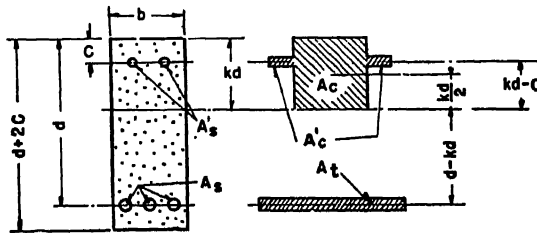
Concrete Beam Action with Double Reinforcement.
